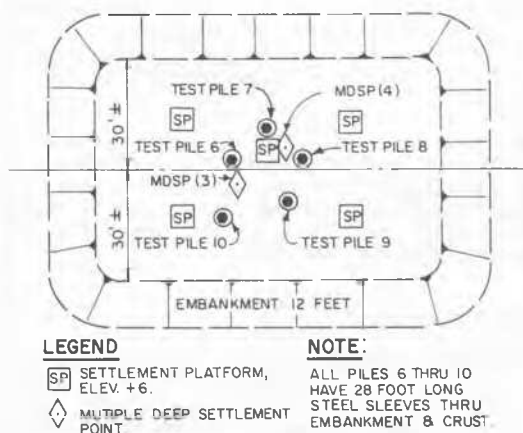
Plan of Test Piles 6 to 10 and Embankment
